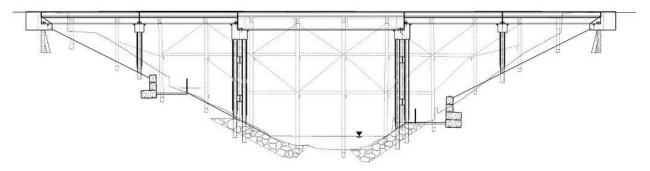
, Elevation View of Recommended Alternate B, looking downstream
